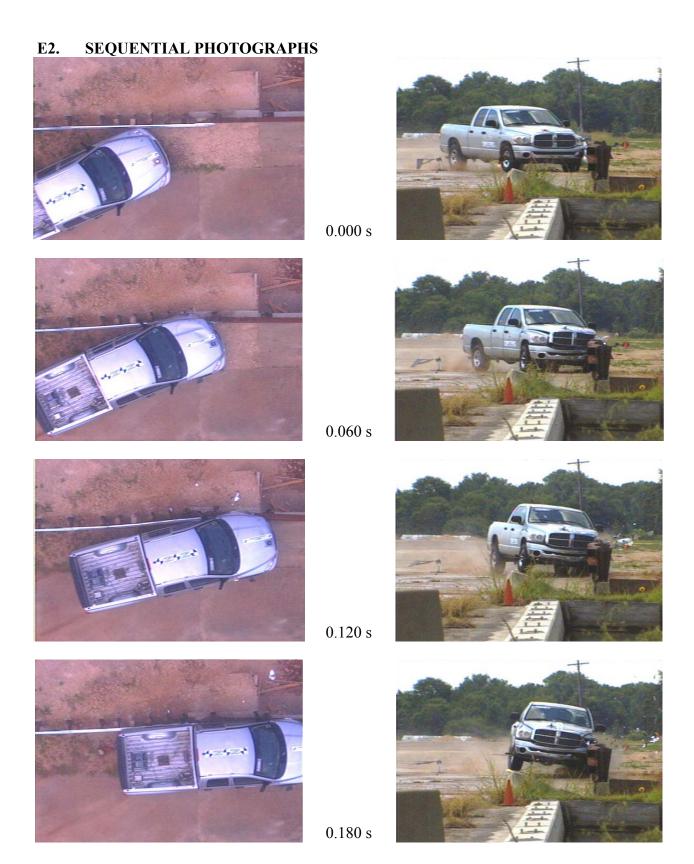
Sequential Photographs for Test No. 490022-8 (Overhead and Frontal Views).
